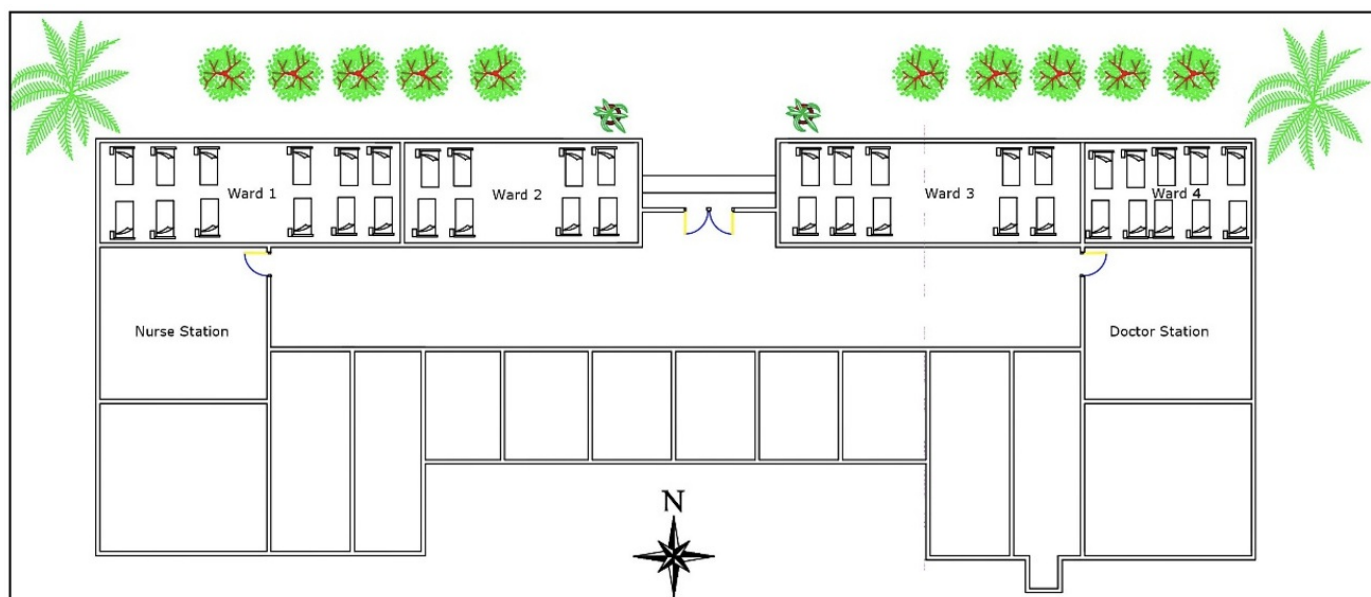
Al-Kadhimiya Teaching Hospital Ground Floor Plan (Source, authors).
